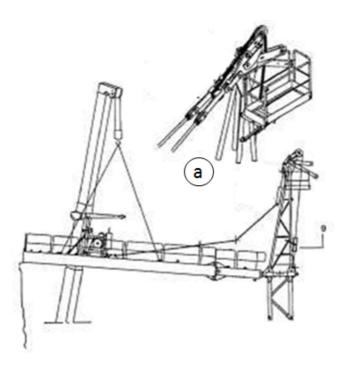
Example of a counter jib and A-frame connection using a connecting rod
